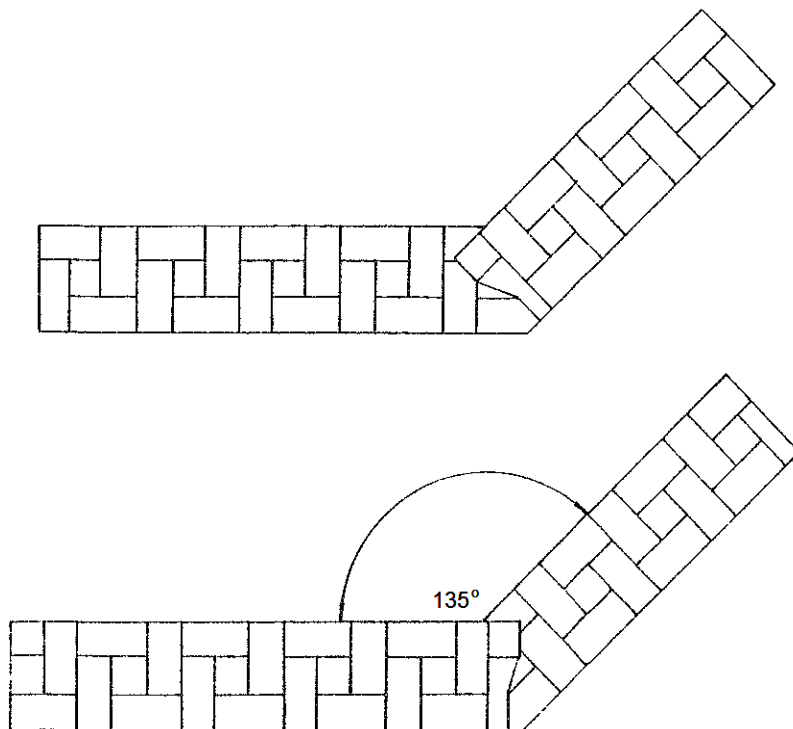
A one-and-a-half brick wall forming a quoin at an angle of 135° (45° splay)
